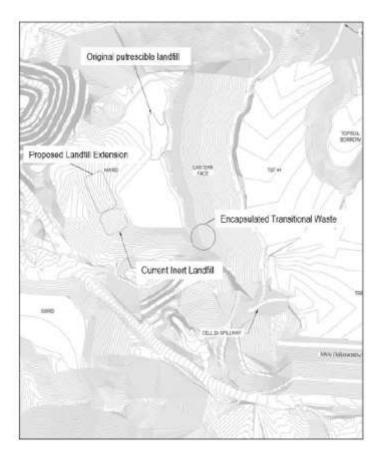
Location of existing and proposed landfill site within north waste rock dump
